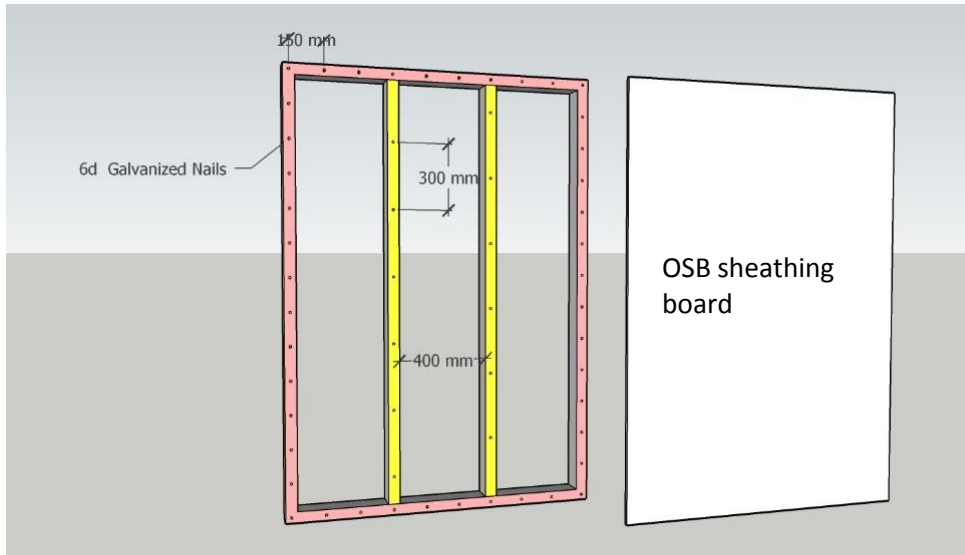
Location of nails to fix the OSB sheathing board to the wood frame
